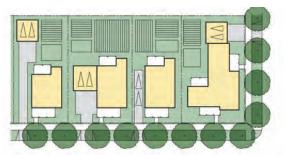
Four street-accessed lots: Although it is not ideal, if homes are street-accessed, garages should sit back on the lots with driveways narrowed where they cross the sidewalk to provide safe passage for pedestrians. This layout provides gardening opportunities at the rear.
